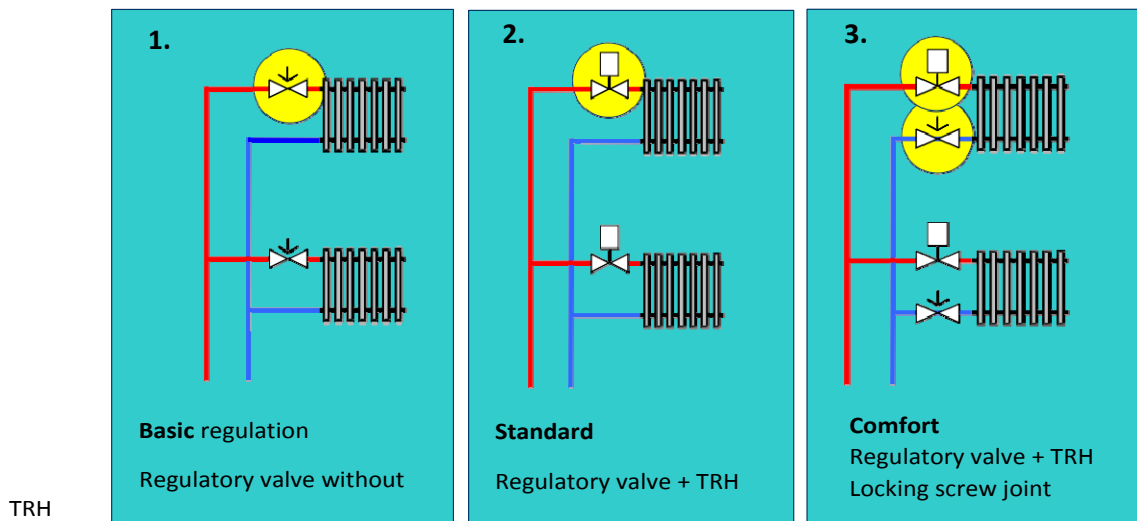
The pictures represent schematic of different regulations of heating systems on heaters. (TRH is thermostatic head fitted to the regulatory radiator valve).
